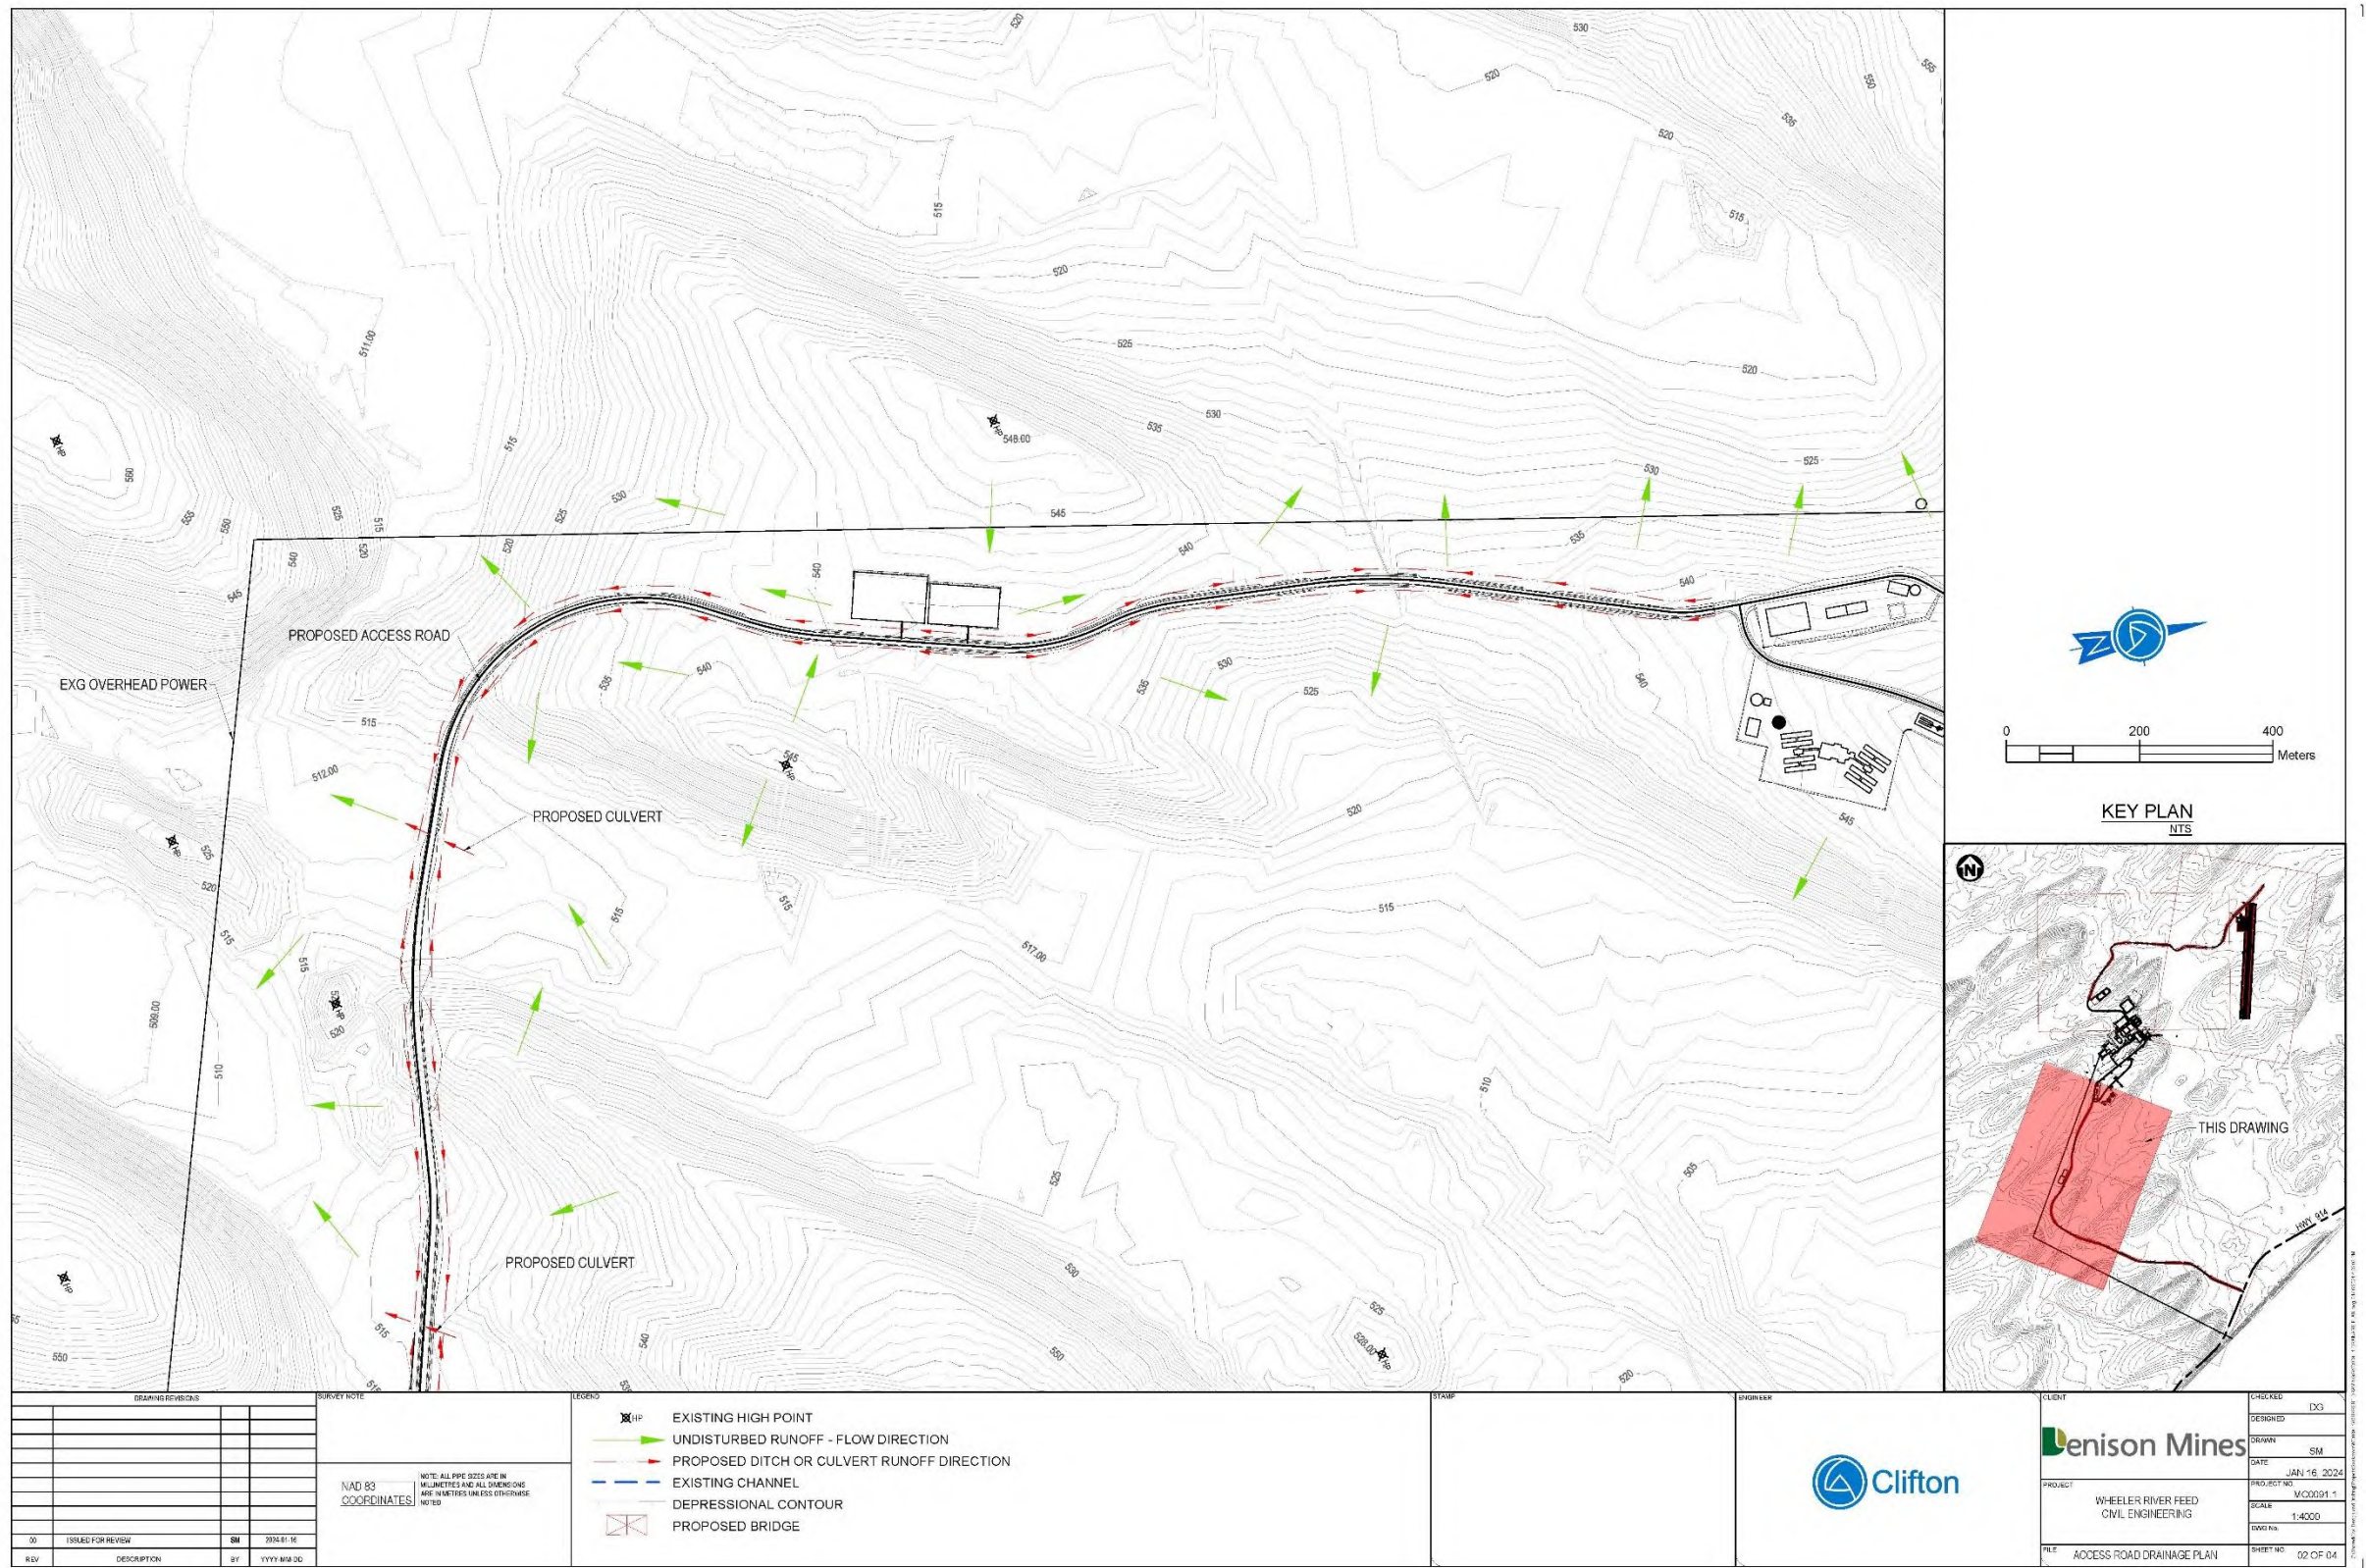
2: Conceptual Site Drainage – Access Road (segment 2 of 2)
